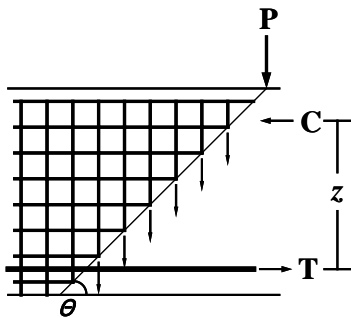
A method using AFRPm with PVA short-fiber mixed shotcrete
